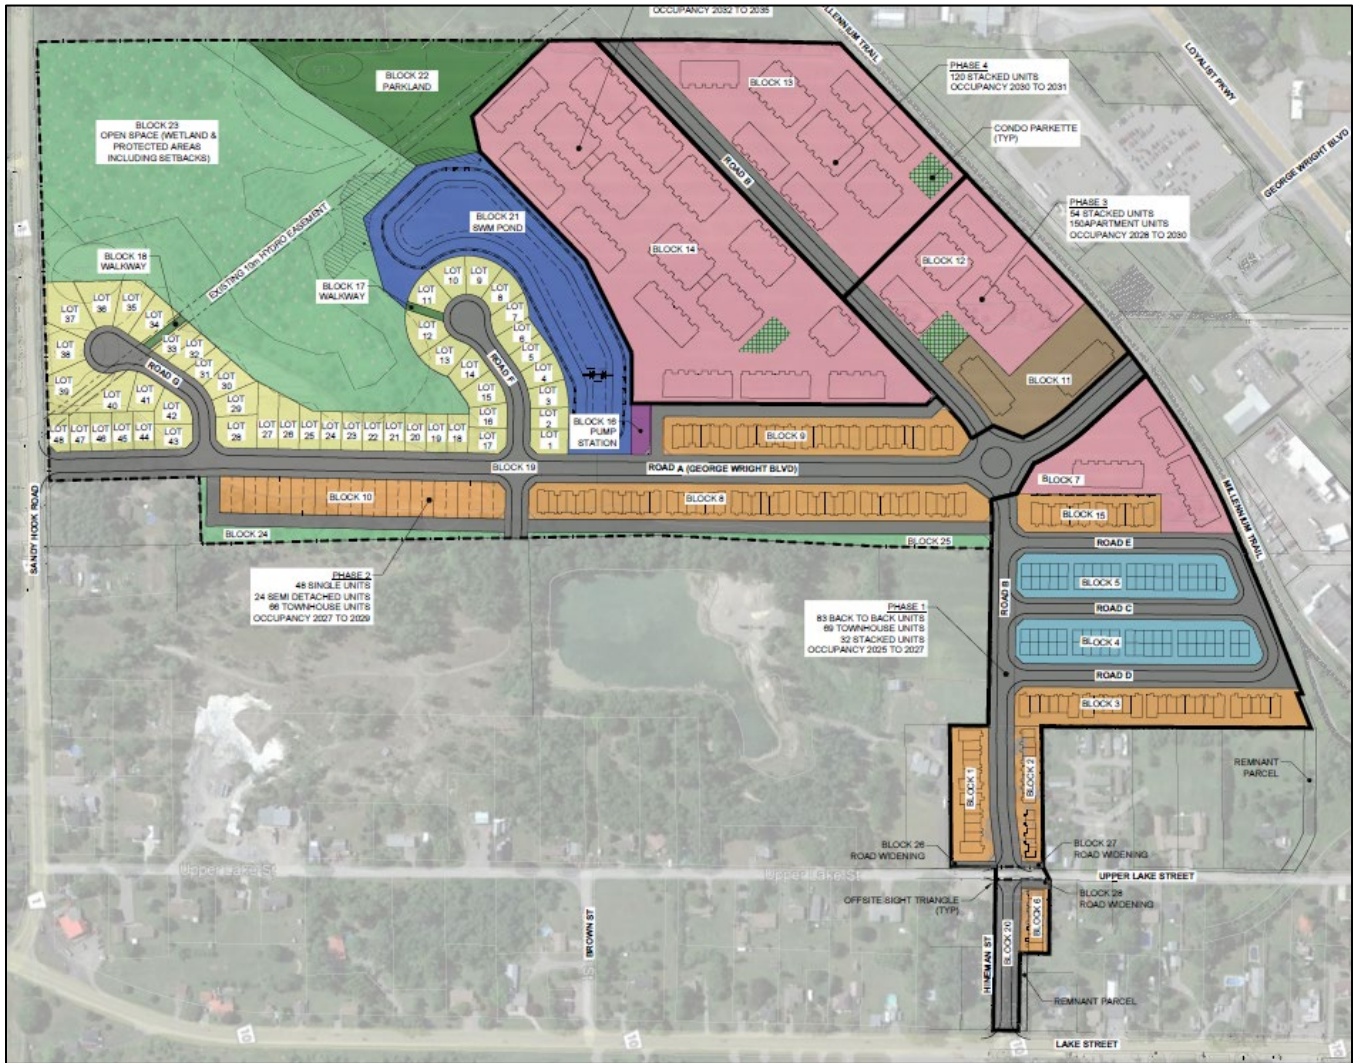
Phasing Plan (Source: Insite Project Consulting Inc.)
